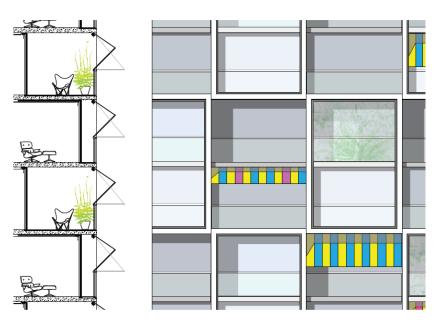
Durbach Block Jaggers - Additional Information: Detail West Elevation
